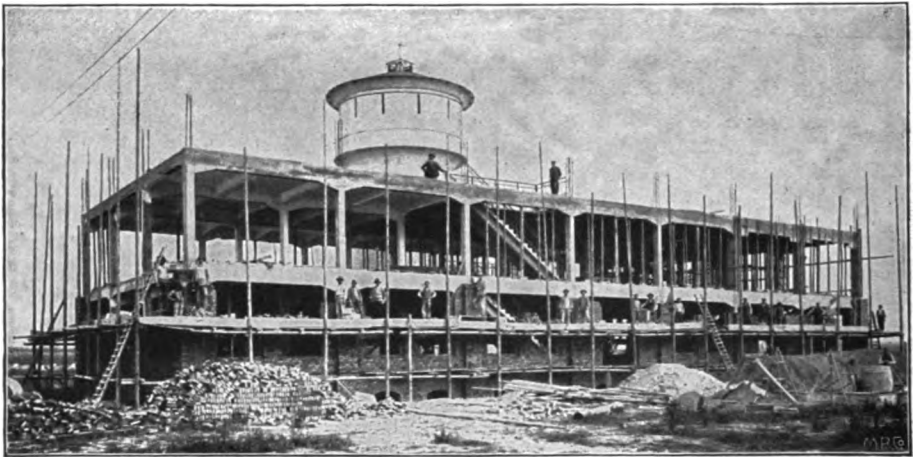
Warehouse for the Government Railway at Elberfeld in Opliden.
